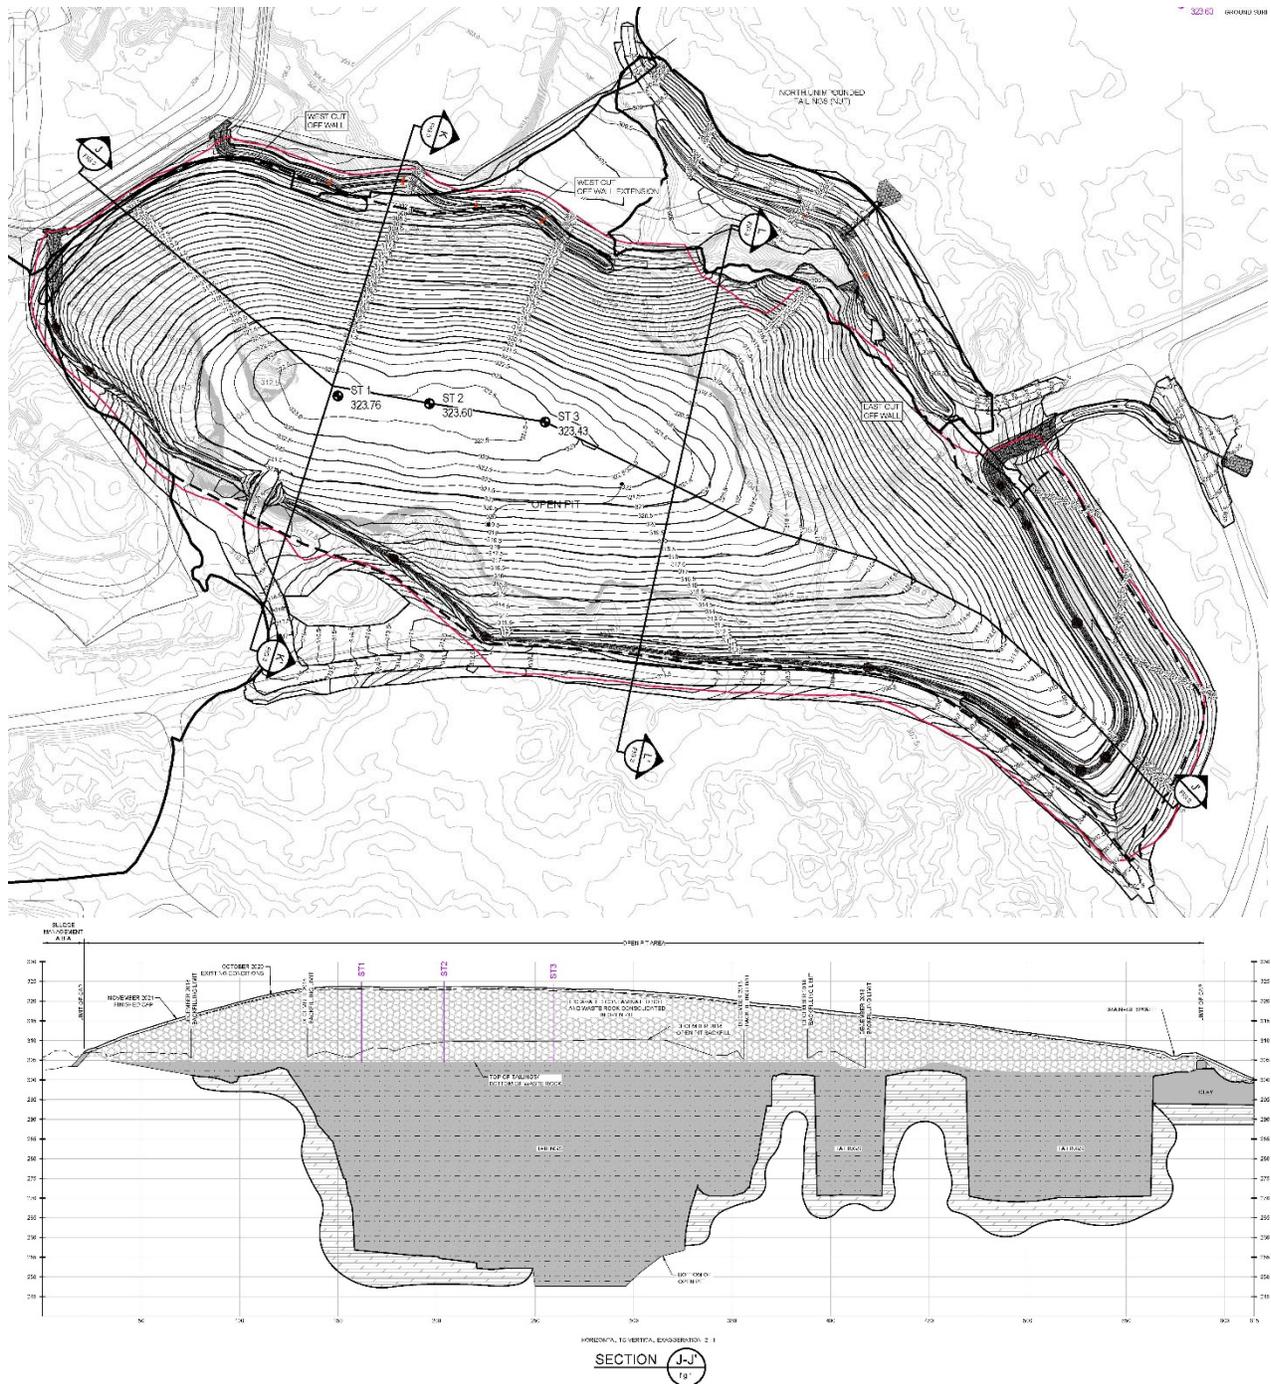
Footprint and longitudinal East-West Cross-Section of the Open Pit Impoundment, Kam Kotia Mine
